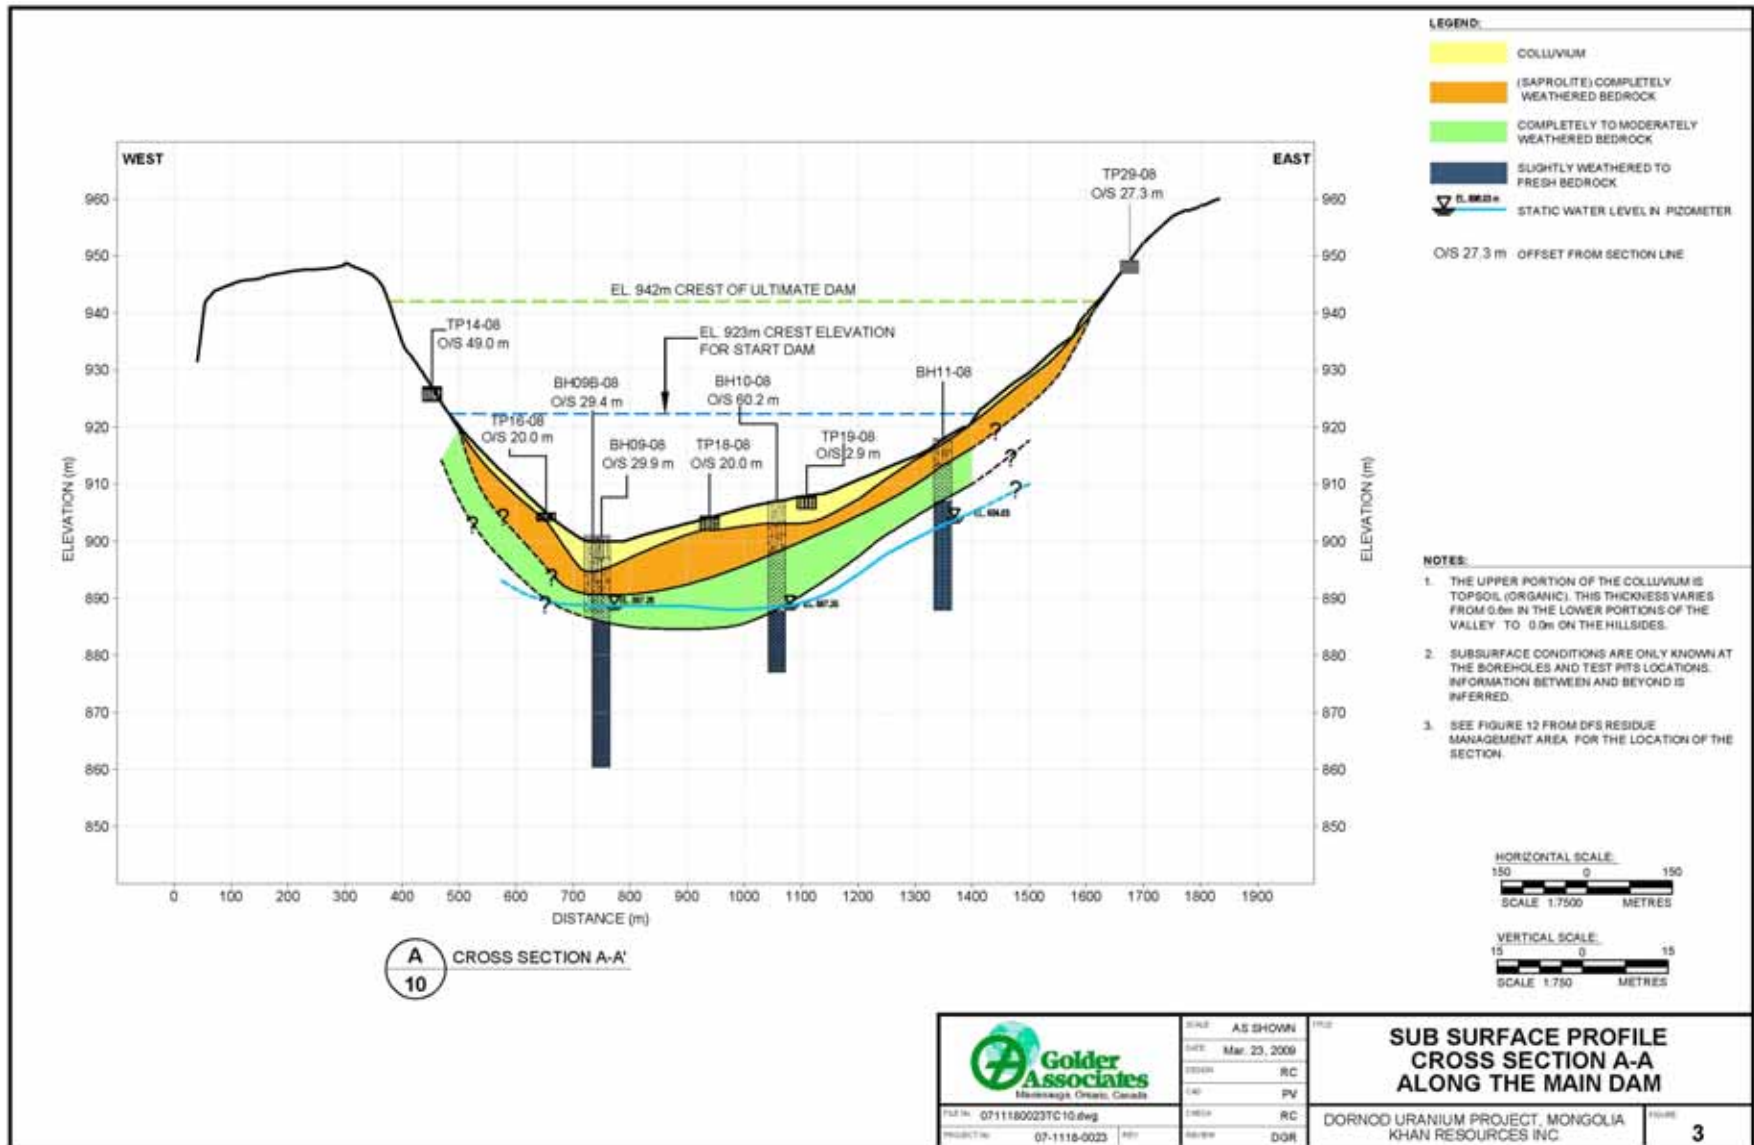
Subsurface Profile Cross-Section A-A Along the Main Dam
